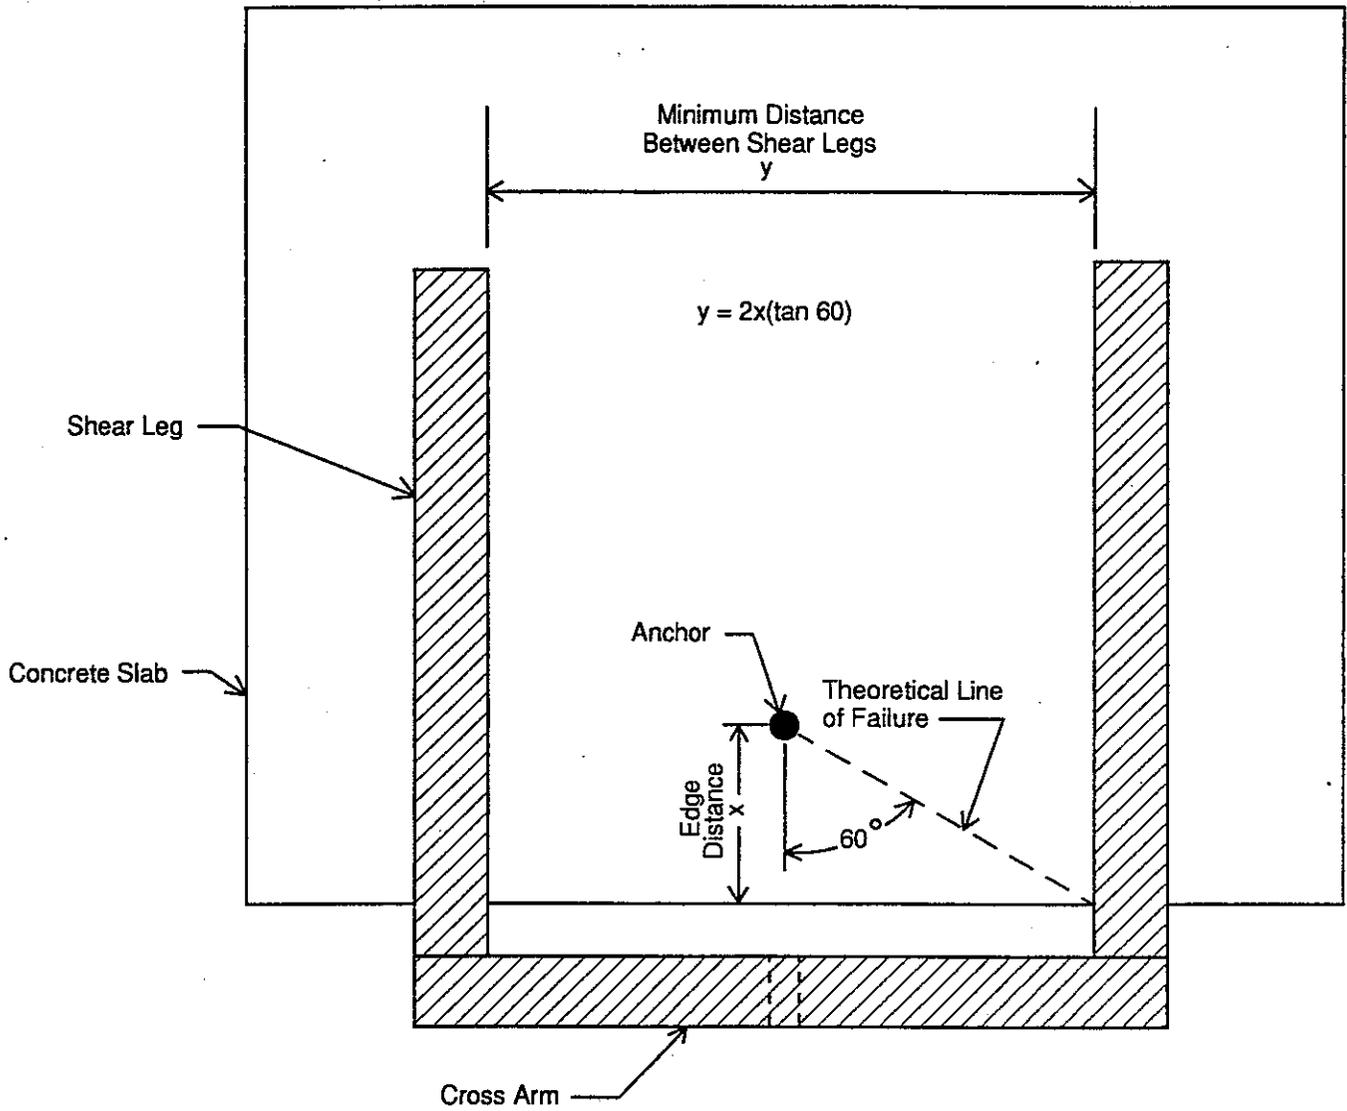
Plan view of minimum leg spacing of shear load test frame.
